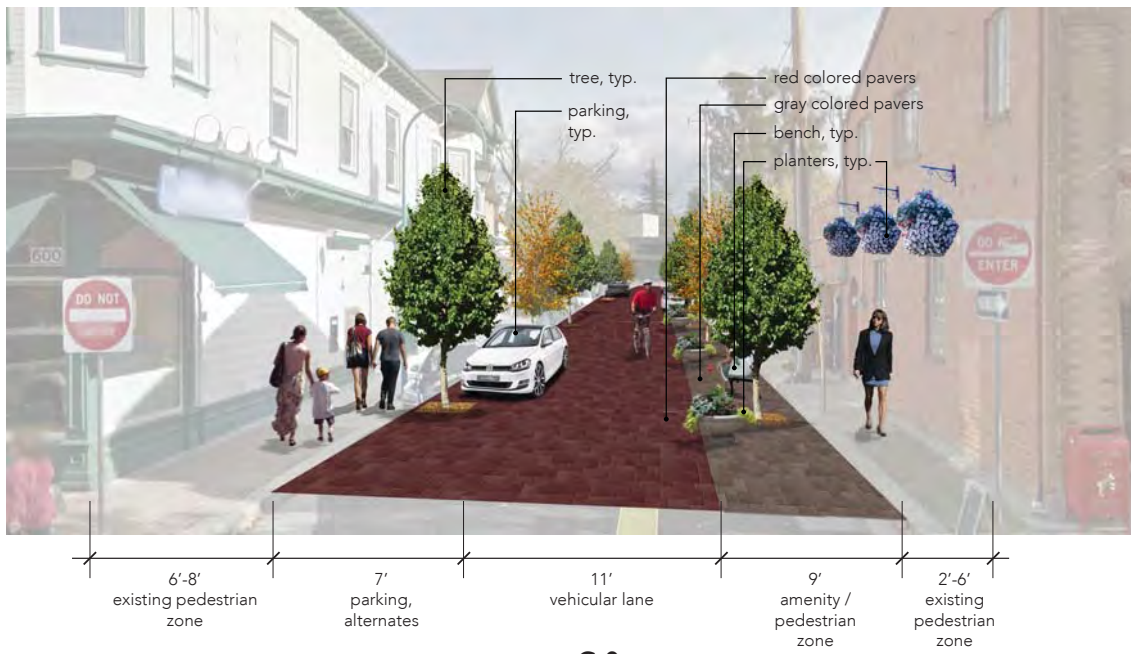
Division Street Streetscape Design Options (Medium Degree Change)
